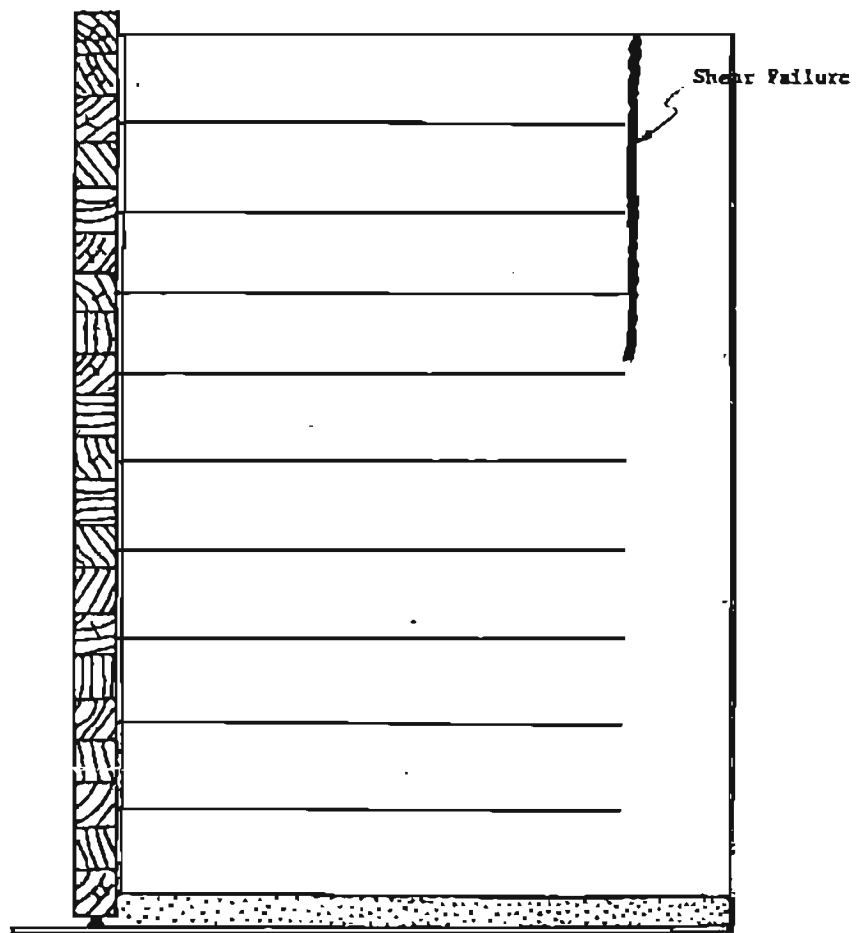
Predicted Failure Condition, Granular Backfill Test Wall
